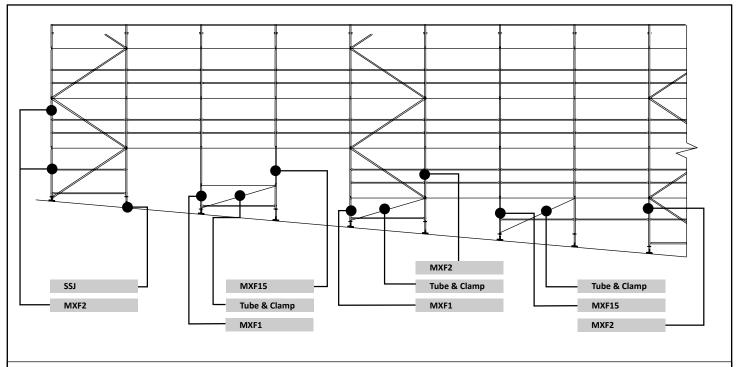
Bracing Base on Uneven Ground - Sloped Ground (Elevation View of Outside Frame Leg)
